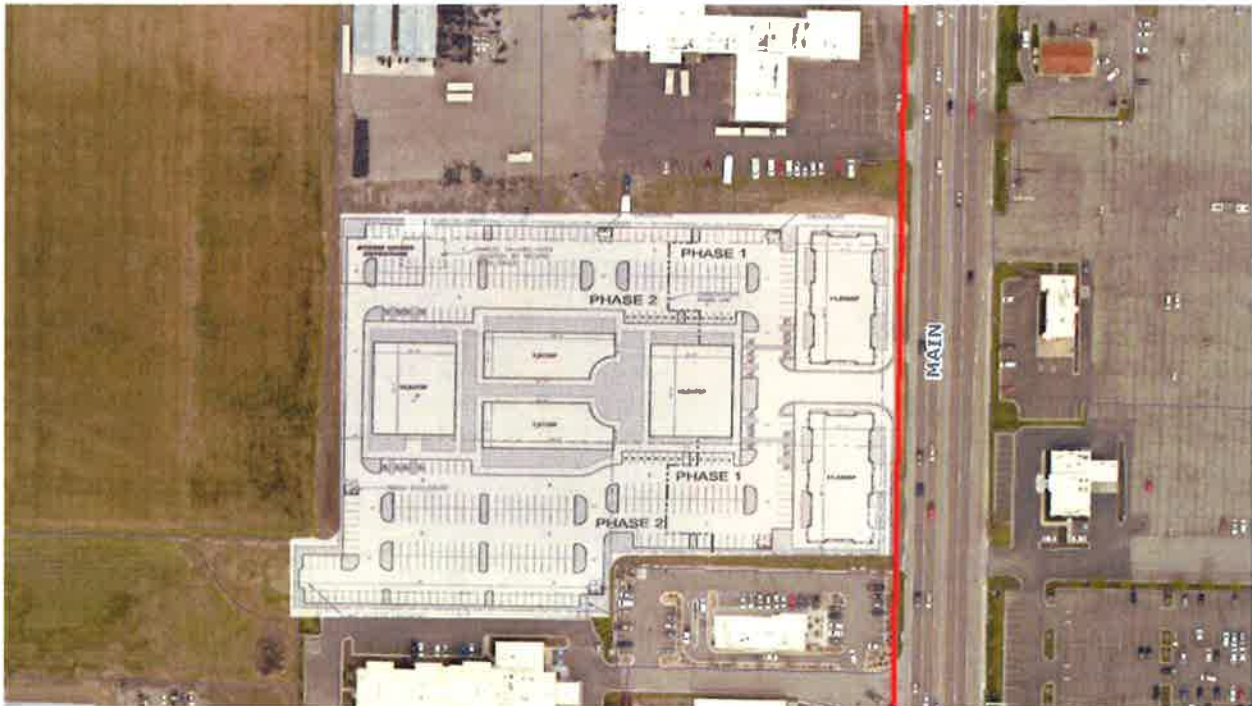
shows the proposed layout of the project with the mirrored Phase-1 buildings near Main Street.
